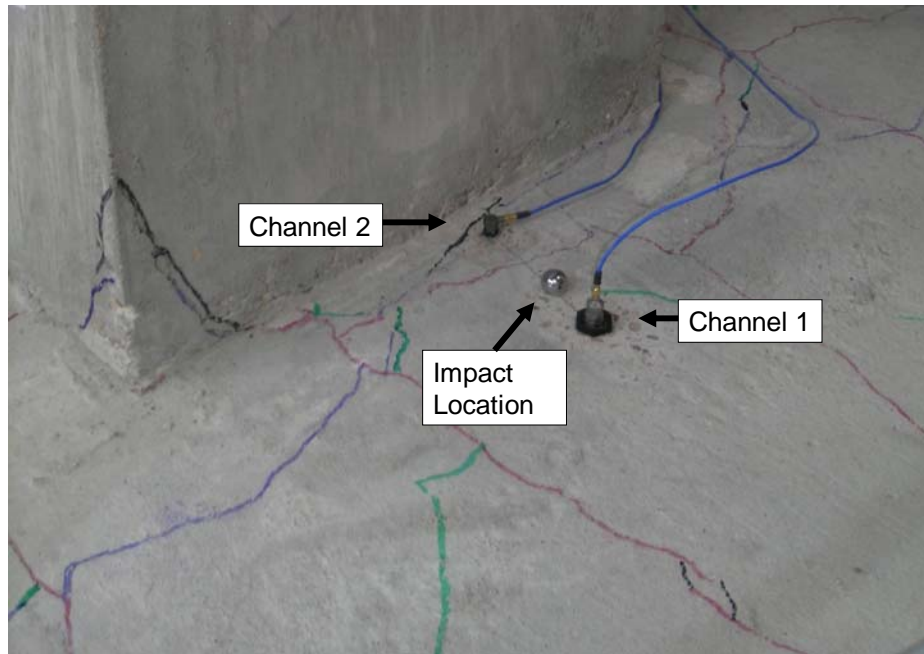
Layout of accelerometers used to measure depth of critical crack in Specimen LR_{ST}G0.5 (South Axis)
